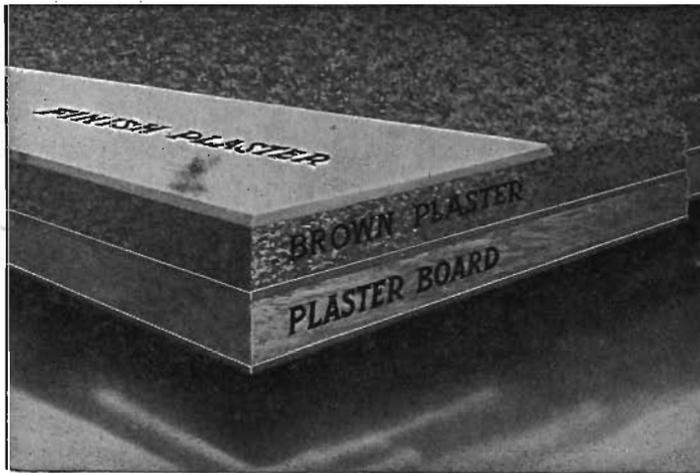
Plaster board and plaster coatings. Courtesy Beaver Board Co.
